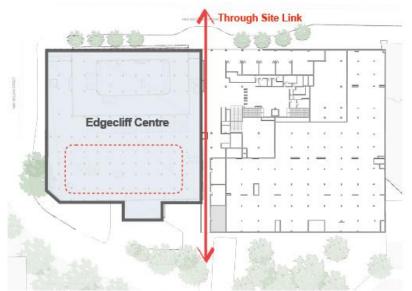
Concept plan showing through site link outside the subject site (Source: FJMT 2020)
